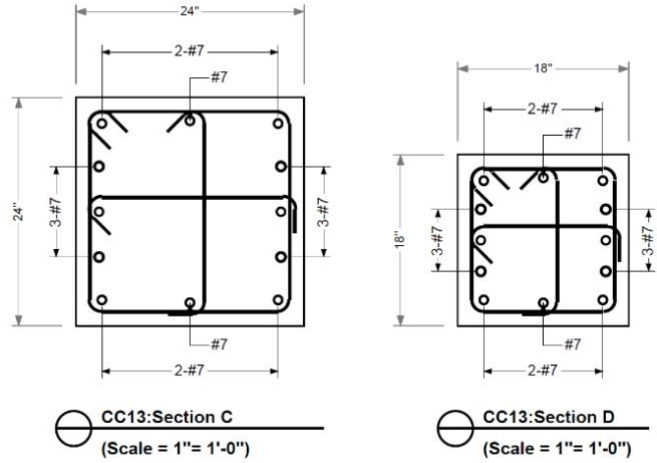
Column 12 & 13 (Rebar Diagram: Section)
